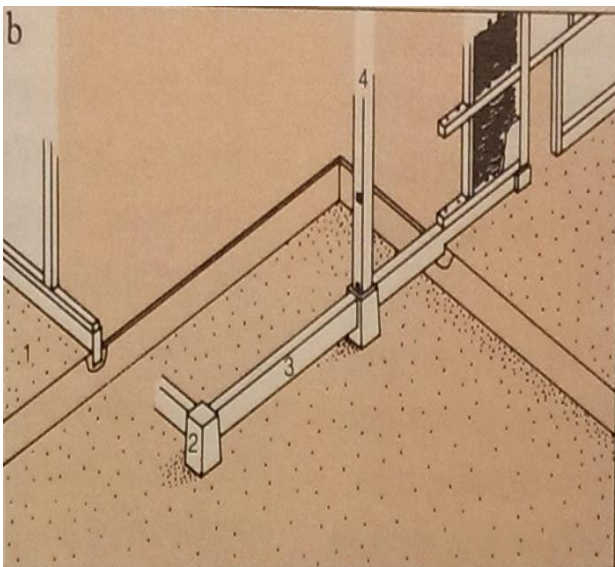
Construction method of brick piers supporting a wooden superstructure. The walls are still of wattle and daub. (Janssen and Treling 1990. Cropped by author)
